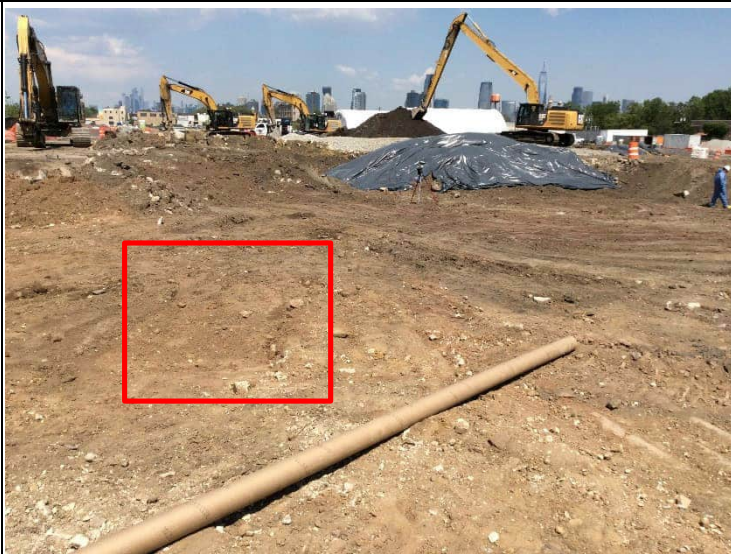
(Left): Facing Northeast. Location of well 10W-MW105I post-excitation.
